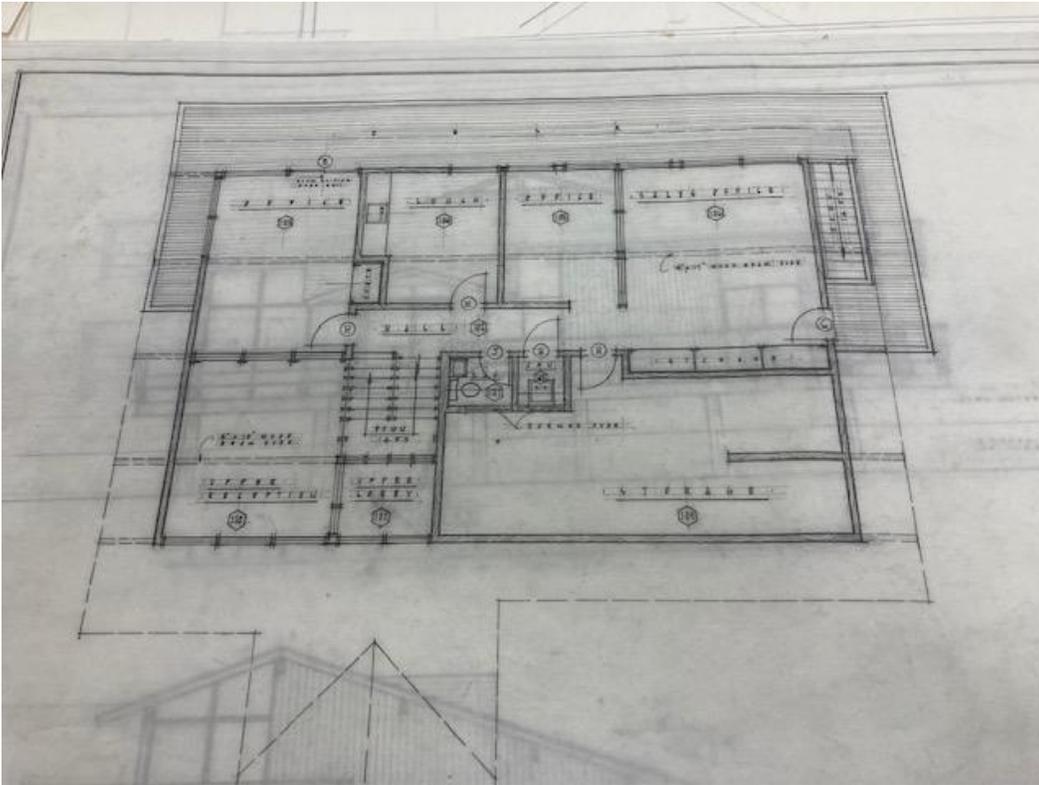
1960 architect's drawings for KGY Studio's first floor plan.
